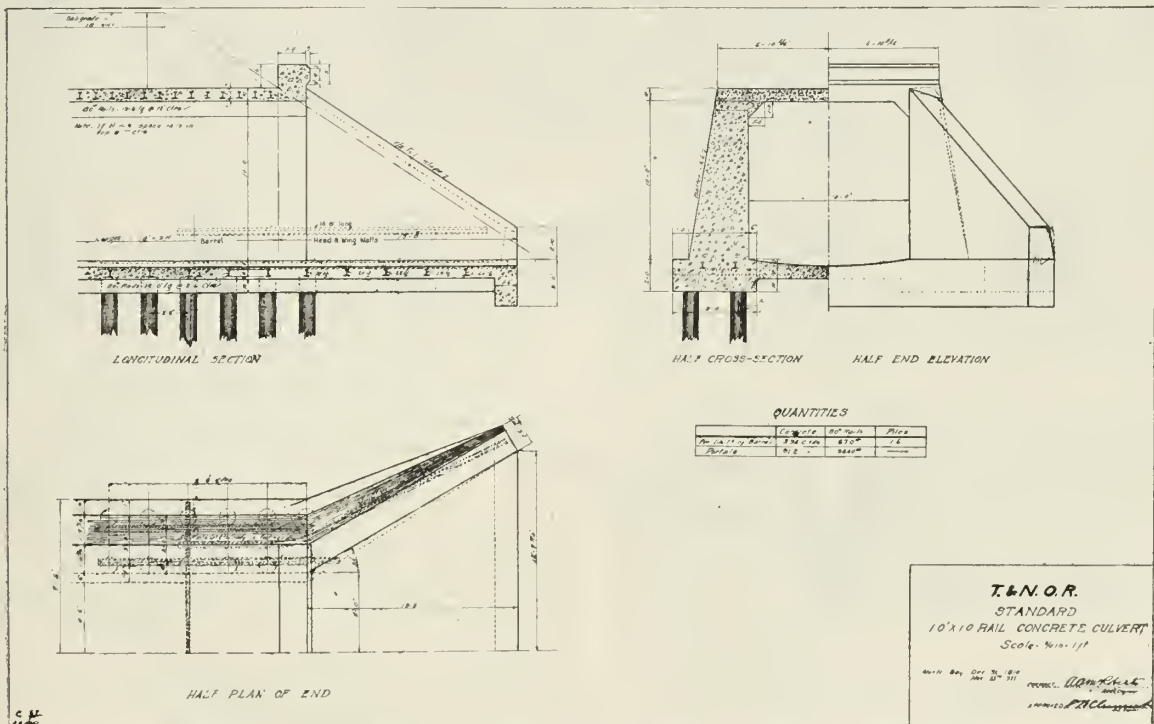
Standard 10-foot by 10-foot Rail Concrete Culvert, T. & N.O. Ry.
